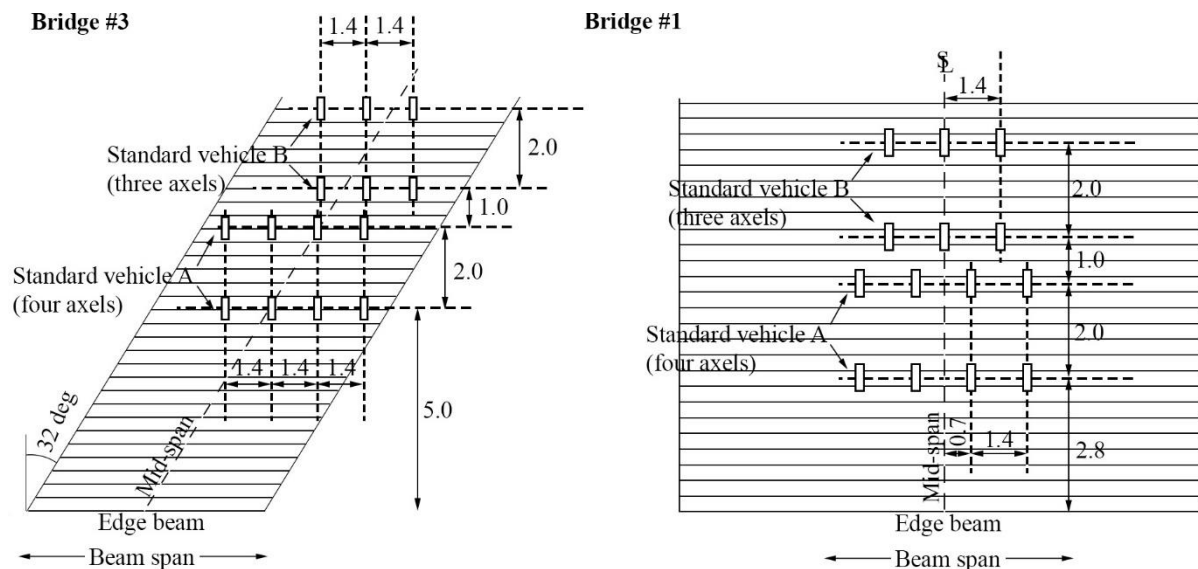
Plan drawing of load setup with positions of wheel loads of trial bridge #3 and main bridge #1. Width of one OT-beam is 0.33 m (1.1 foot). Units in meters.
